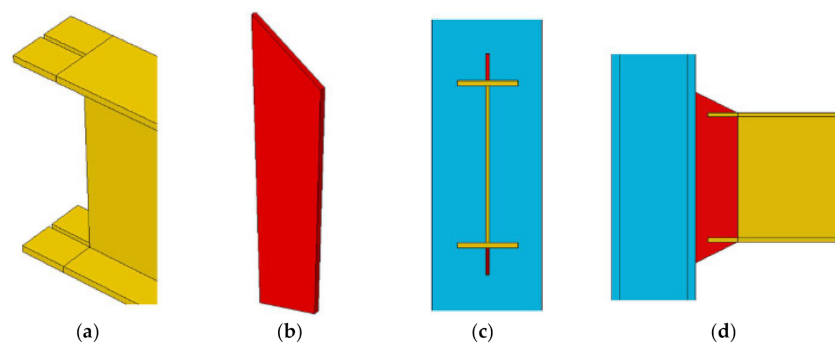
Connection with an absorber plate: (a) cut beam, (b) connection plate, (c) front view, and (d) side view.
